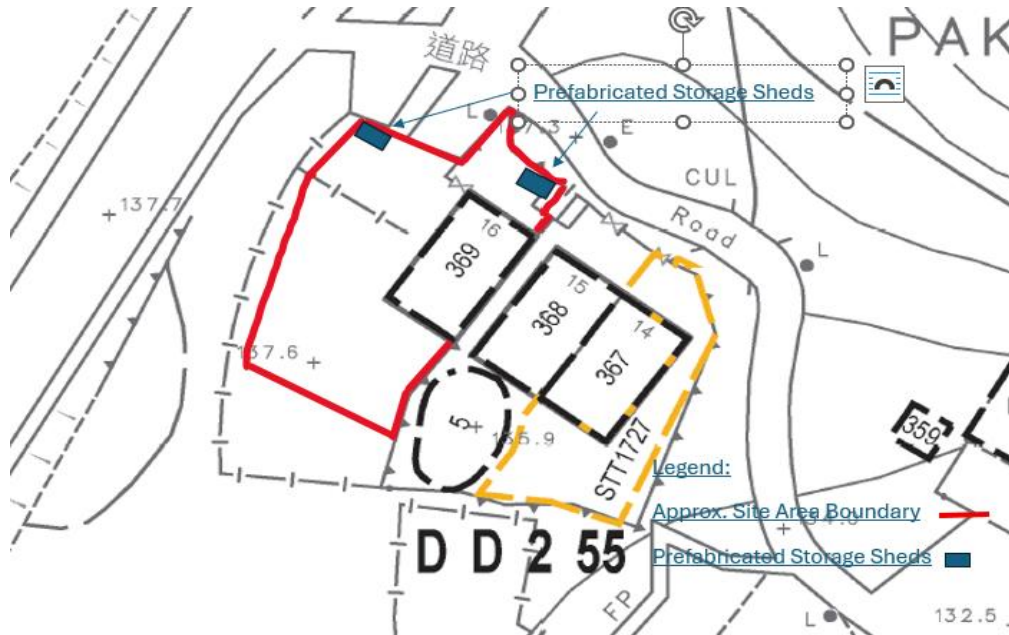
Boundary plan of the proposed temporary private garden, also showing the proposed location of two prefabricated storage sheds.
